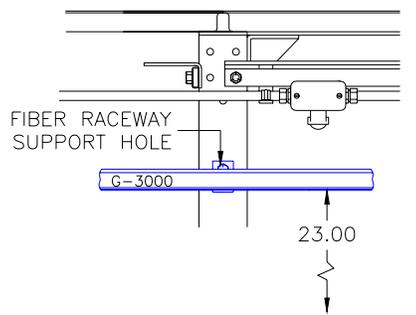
B – Assembly Of Fig. 9-12A Auxiliary Support Bars
